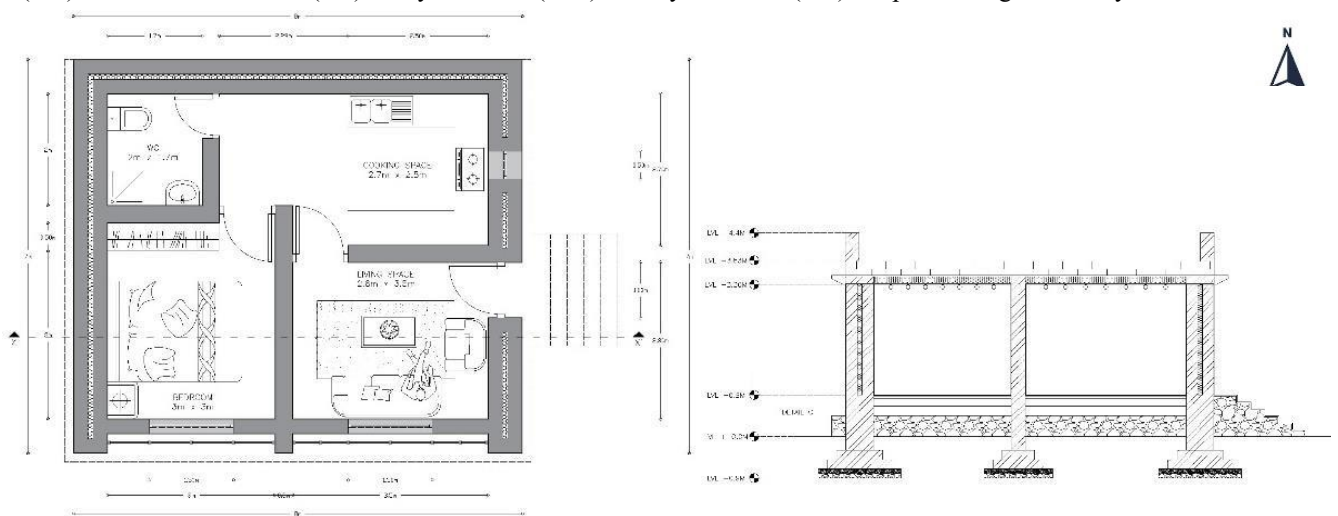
(a) Plan (1 BHK 8m x 7m) (b) Section AA
